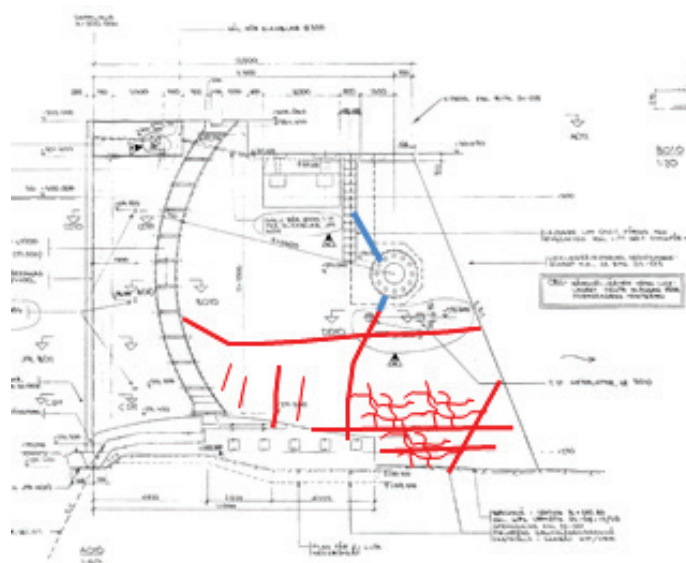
Pier 2, right-hand side: Observed cracks 2011-10-31. Blue lines show cracks observed both on the outside and the inside of the shaft down to the gate shaft.
